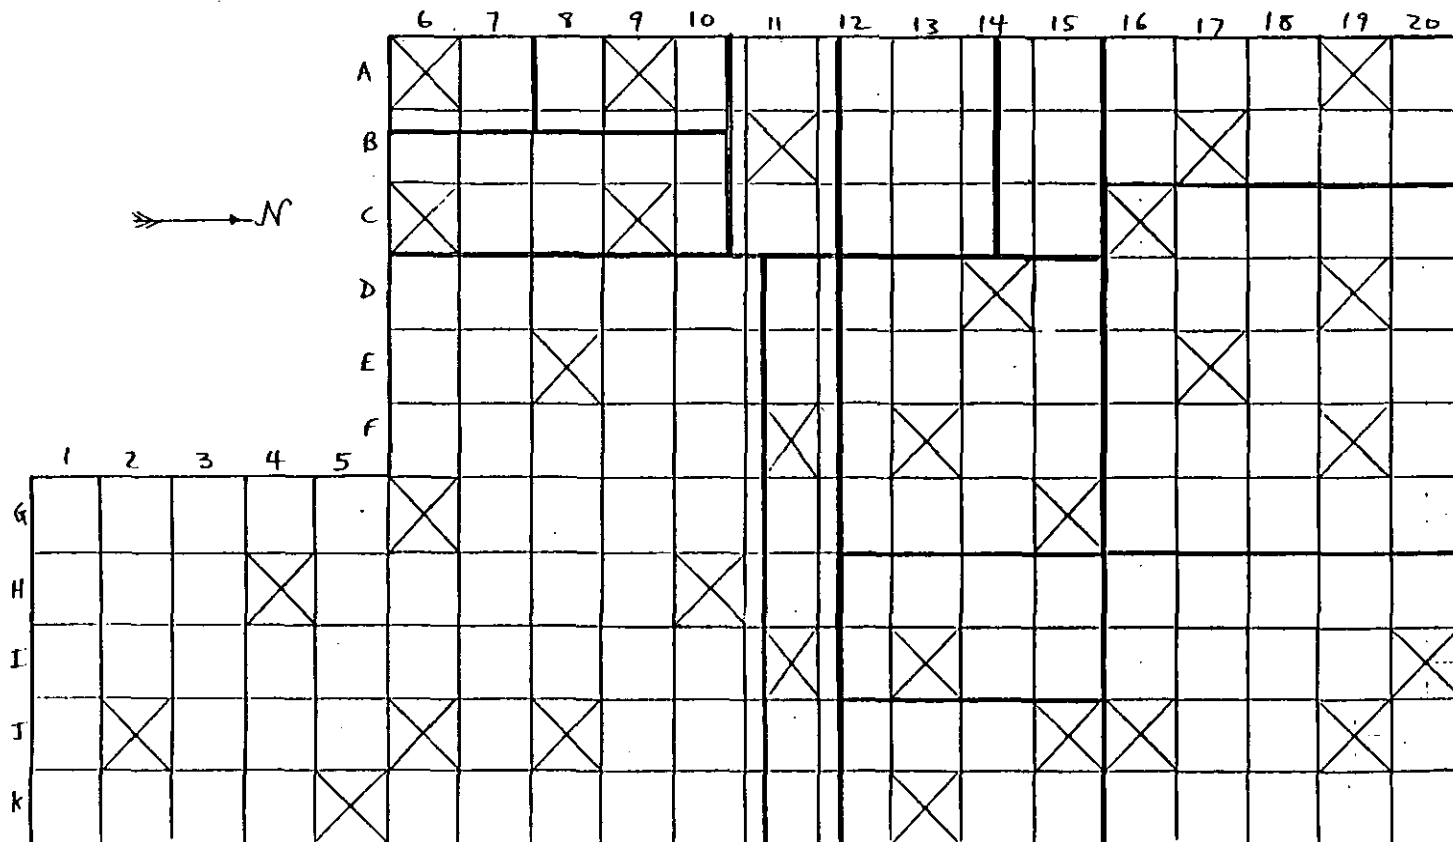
Survey Grid Locations, Building 8 Office Auxiliary Area -- Ceiling
